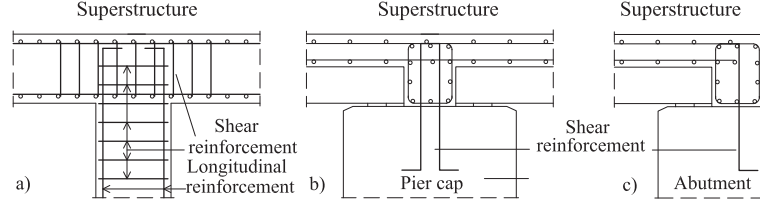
Monolithic joint types. a) Piers are joined directly to the deck (*Type 1*; slab bridges). Shear reinforcement is applied between: b) the deck and the pier cap (*Type 2*; PMG bridges); c) the deck and the abutment (*Type 2*; both PMG and slab bridges).
